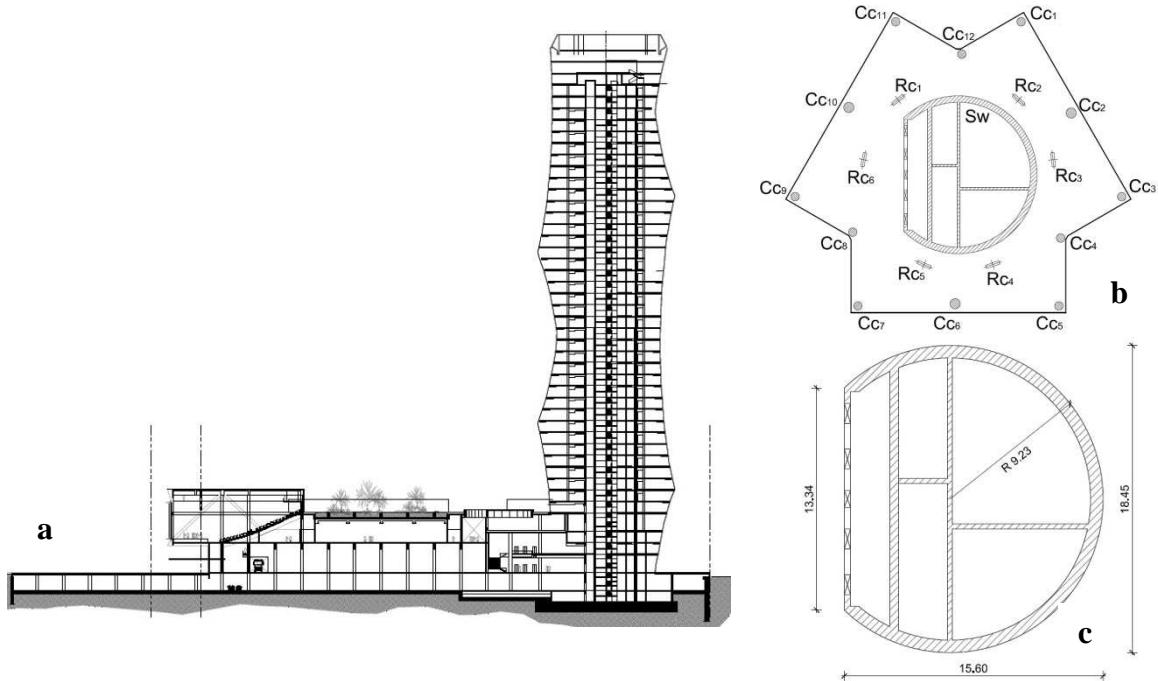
New Marina Casablanca tower cross section (a). Planimetric structural layout of the New Marina Casablanca tower showing the main horizontal resistant members (shear walls-Sw, circular coulmn-Cc, rectangular coulmn-Rc) (b). Shear walls' geometric dimensions, in metres (c).
